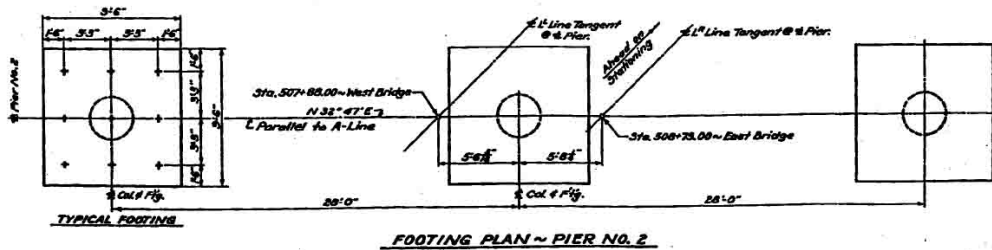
Bridge 5/649 Footing Detail
